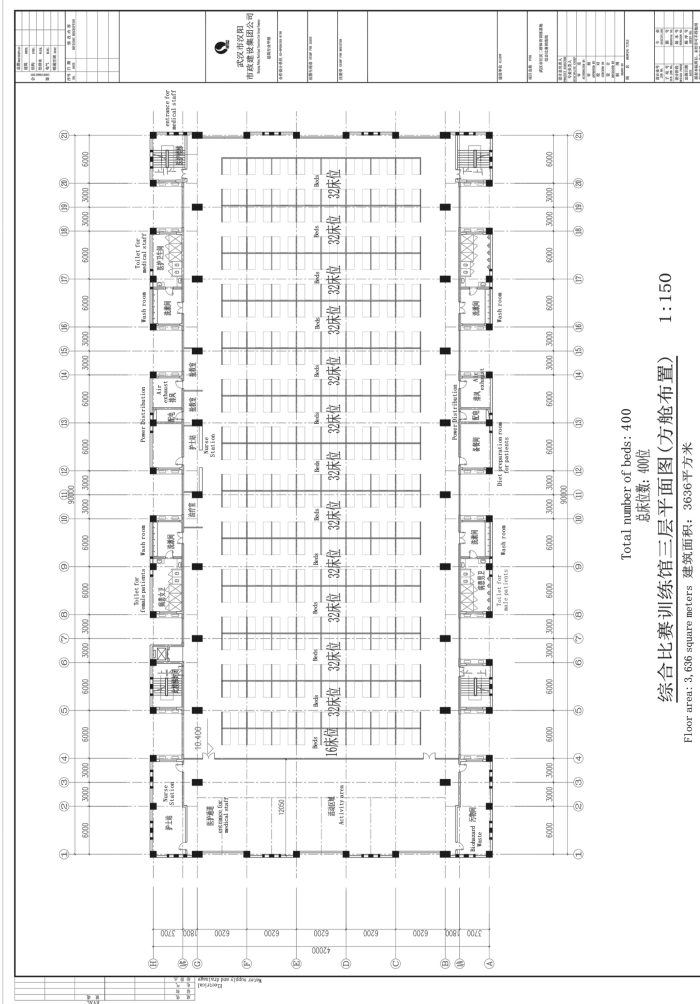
Plan of Hanyang Fangcang Shelter Hospital Floor 3
